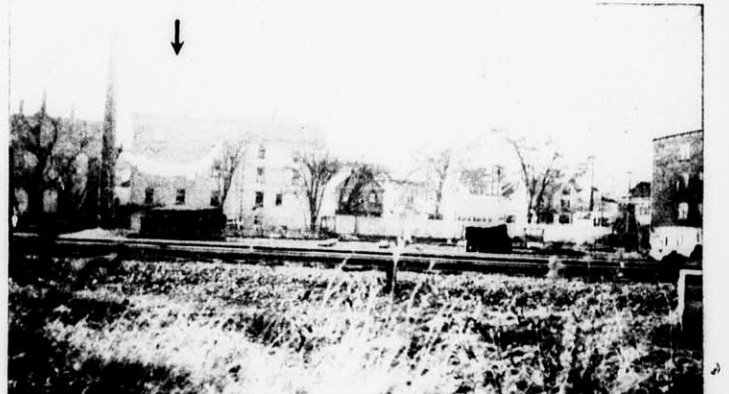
Plate F. From Boston & Maine Railroad looking westerly showing open land and wooden buildings in proposed location for new highway.
